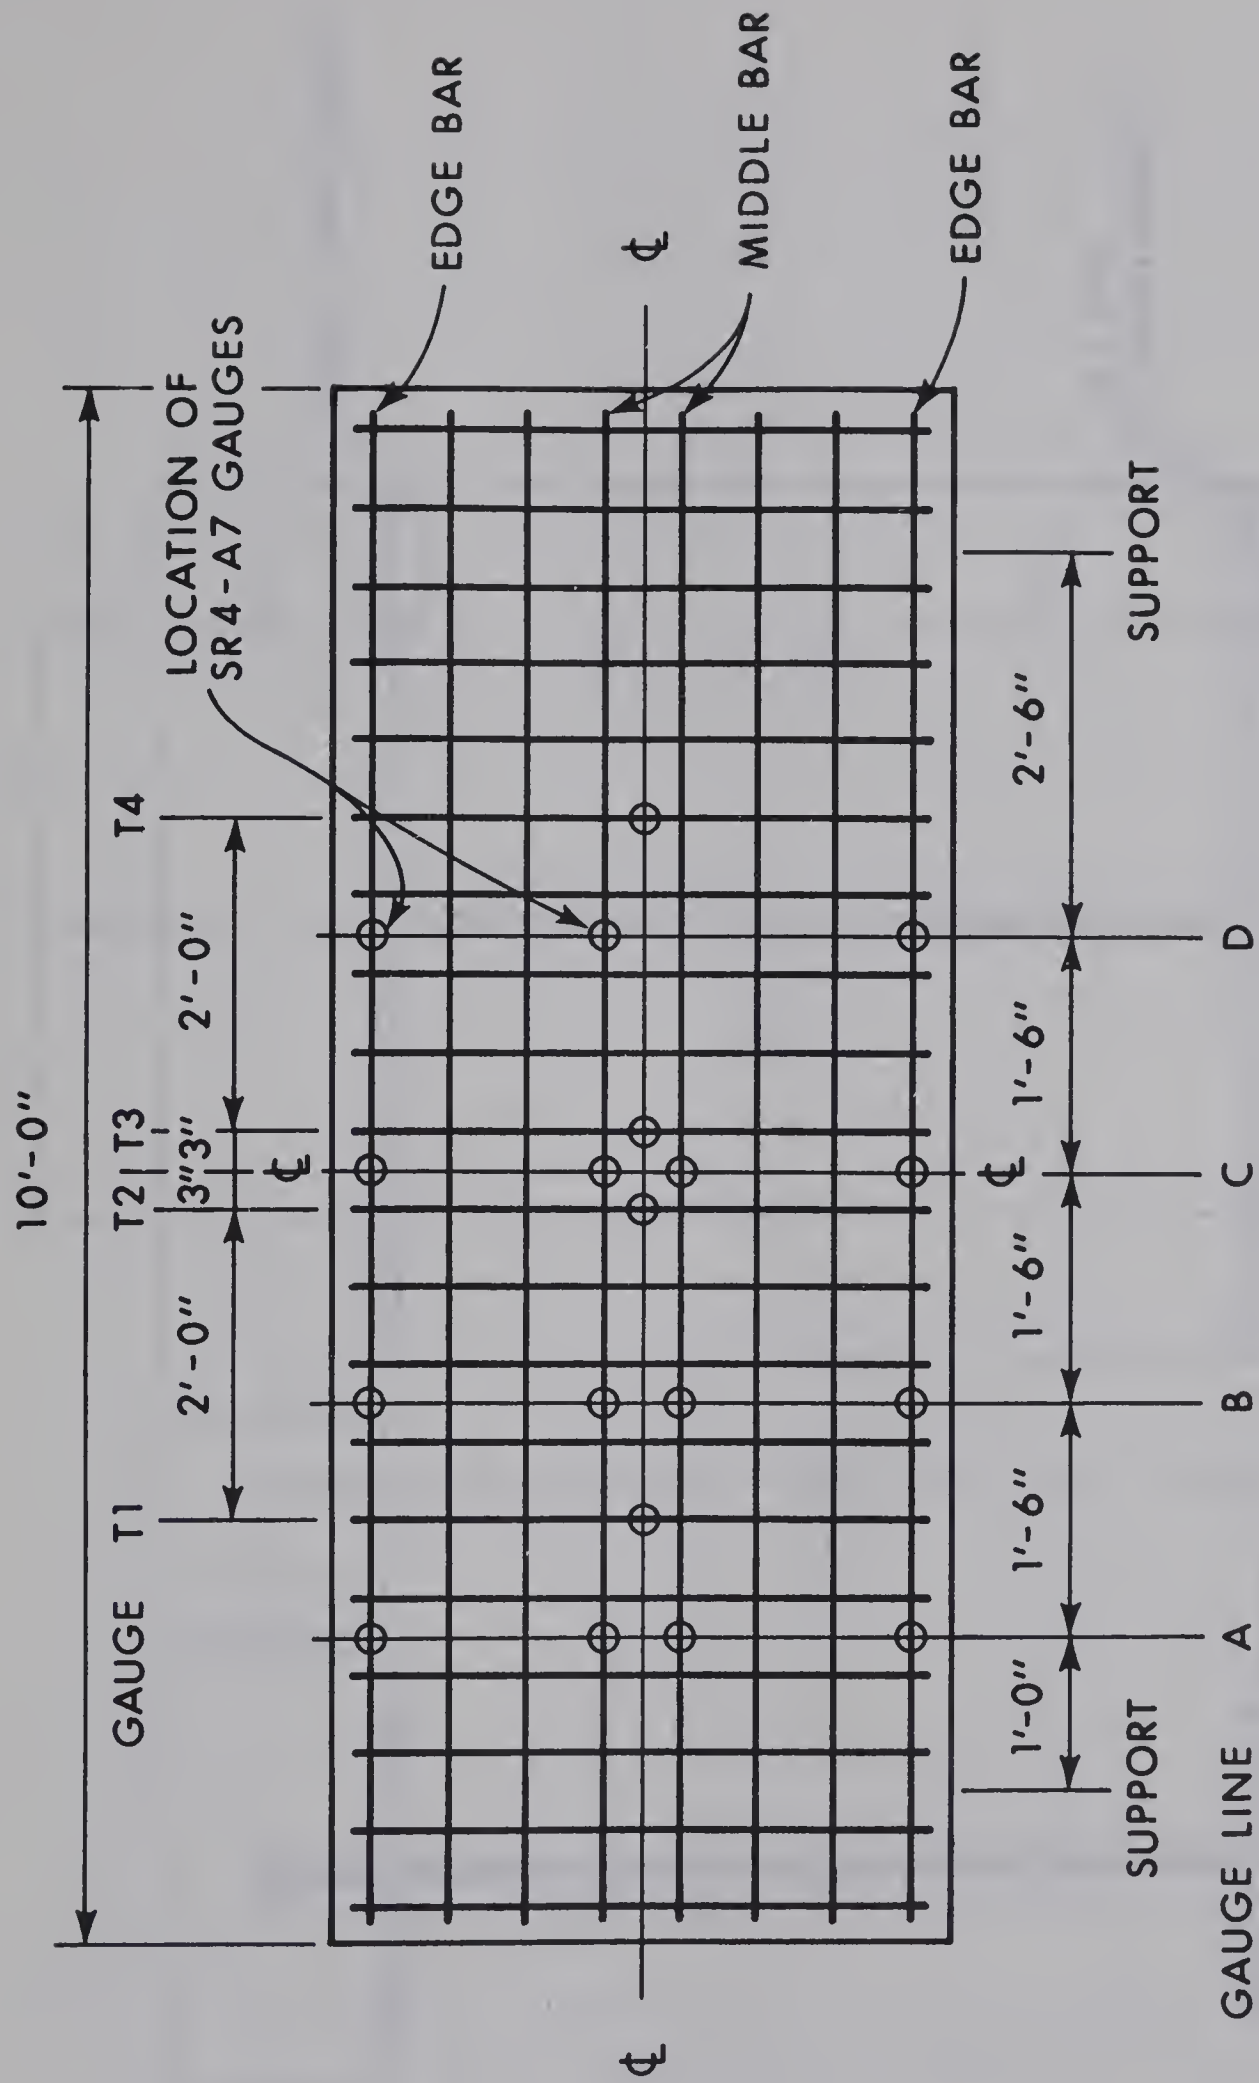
GAUGE LOCATIONS FOR SLAB REINFORCEMENT
